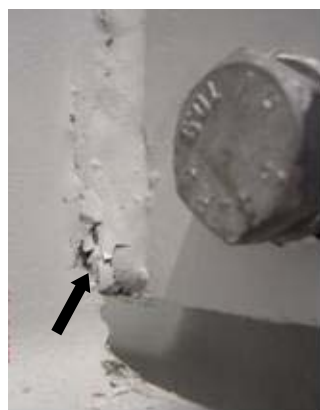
Fracture Near the Fillet Weld Connection (Specimen BF-H, Cycle 27 and Top Disp. of 58.53mm)
